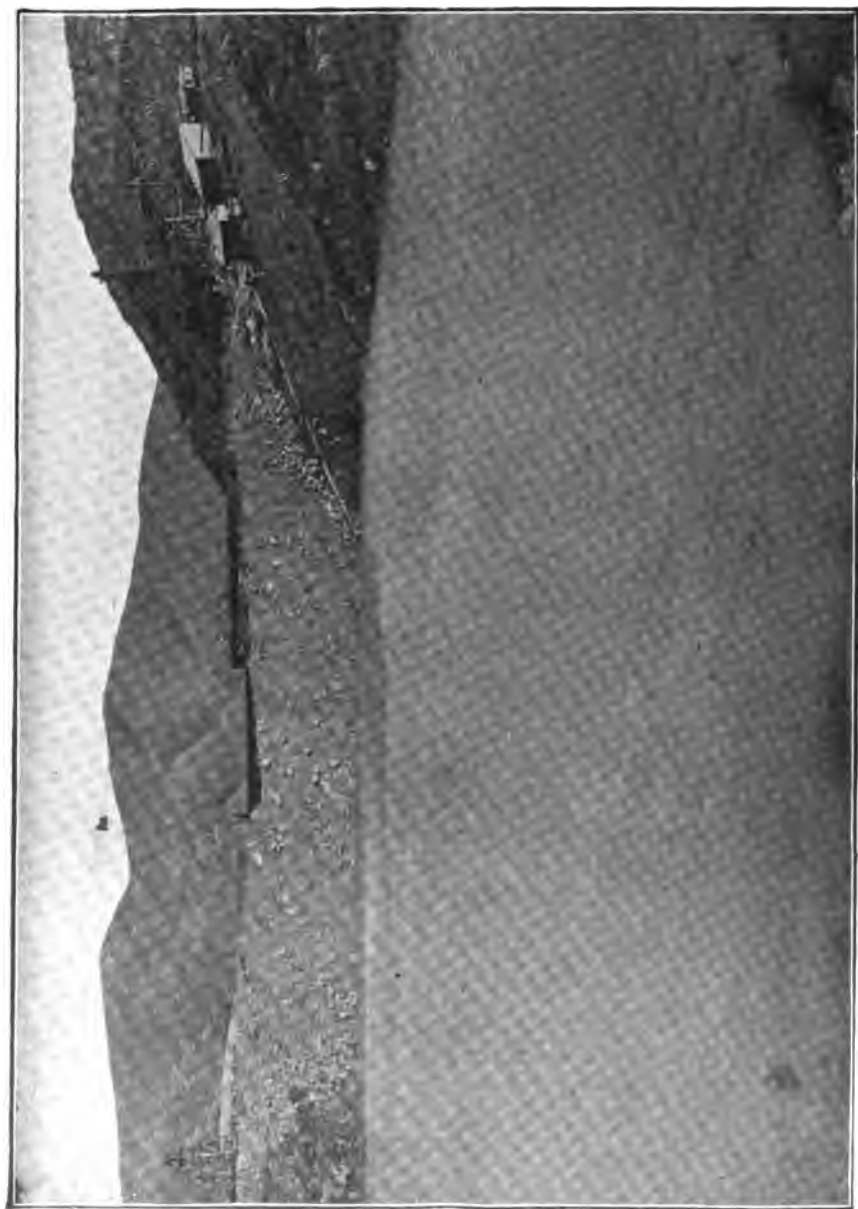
OTAY (CAL.) ROCK-FILL DAM—STEEL CORE.
